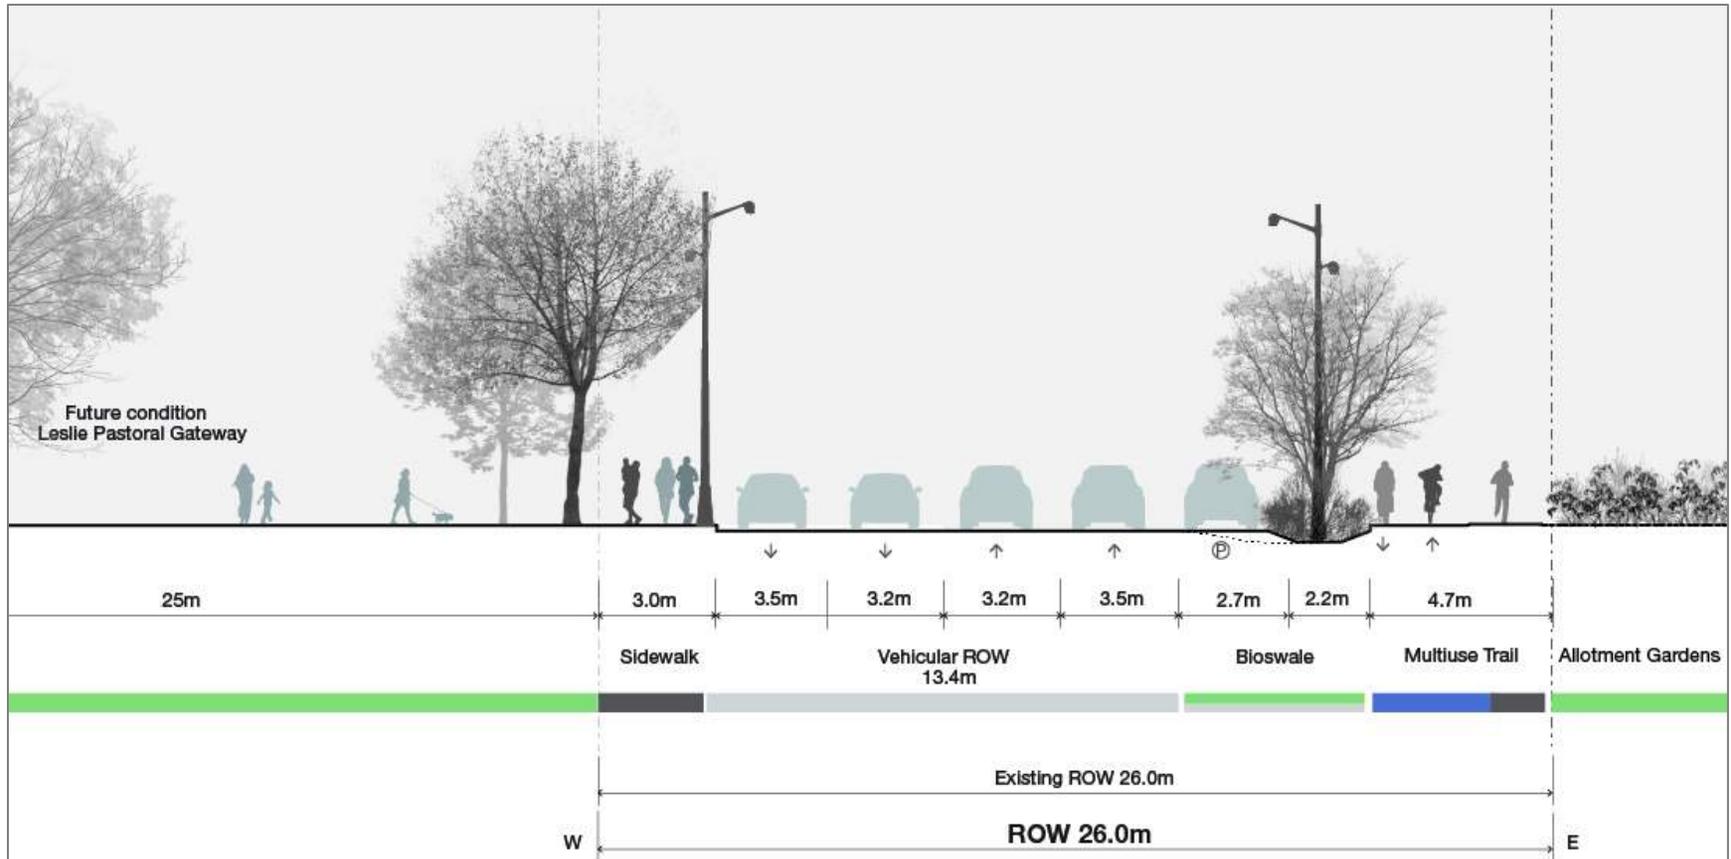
CONCEPTUAL CROSS-SECTION – NEW NORTH-SOUTH STREETS
